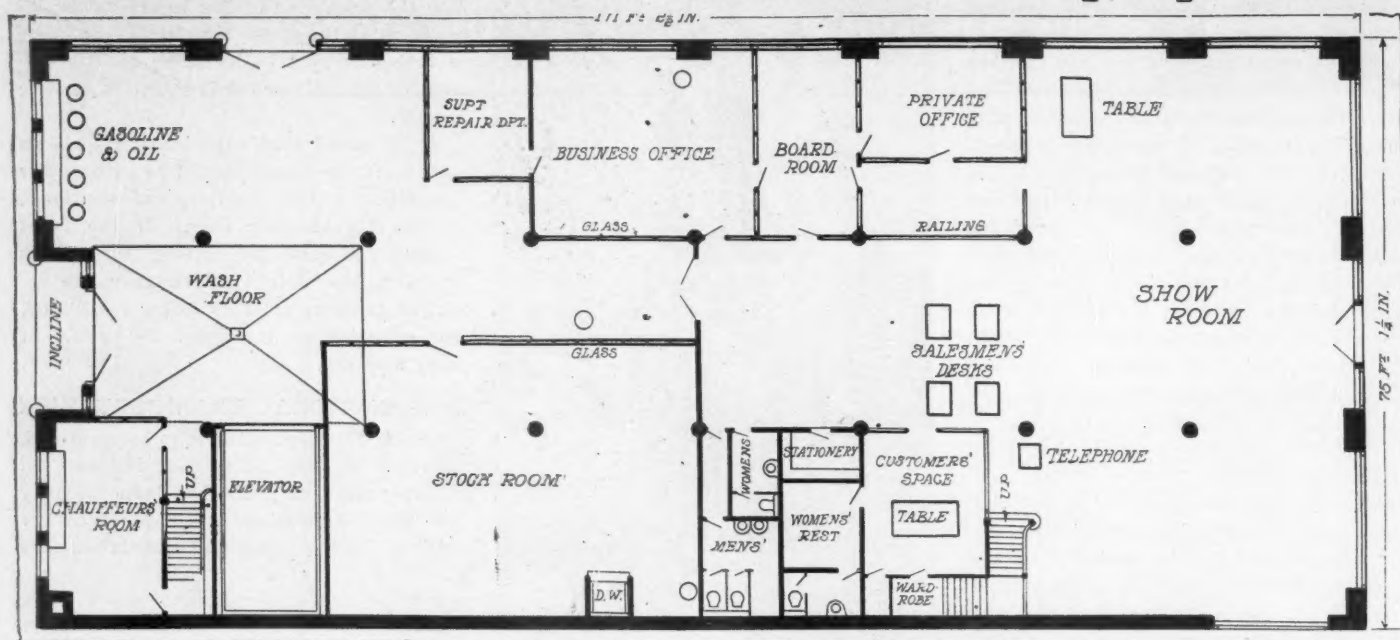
FIRST FLOOR PLAN OF NEW CHICAGO BRANCH HOUSE OF LOCOMOBILE CO.
